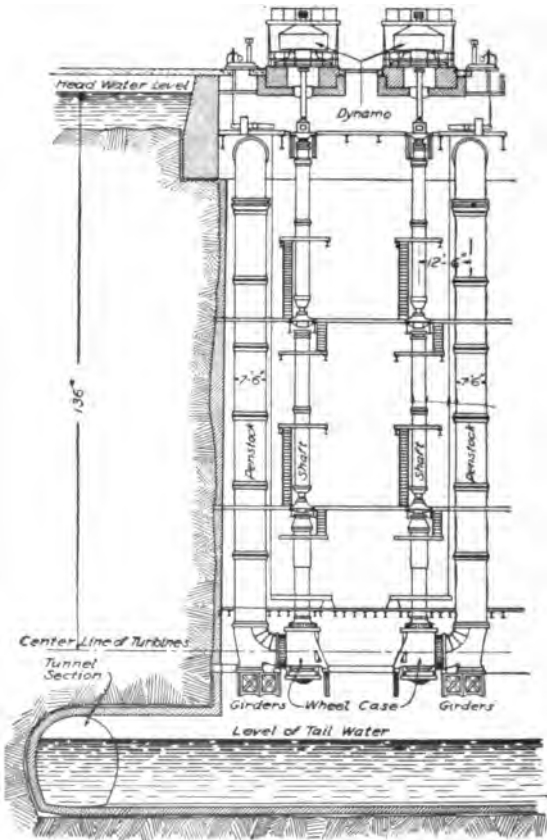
Longitudinal Section through Portion of Wheel-Pit of Power-House No. 1, Niagara Falls Power Company.
